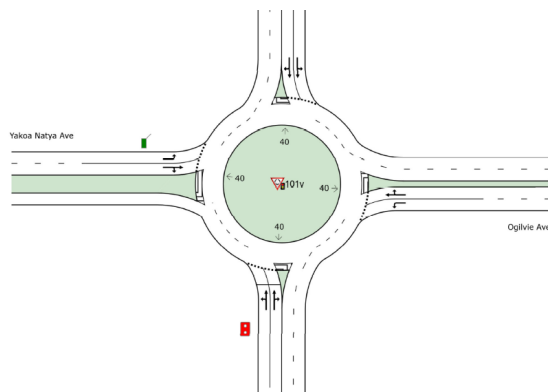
IN-02 Metered Interim Two-Lane Roundabout Upgrade (Metering Added in 2037)
